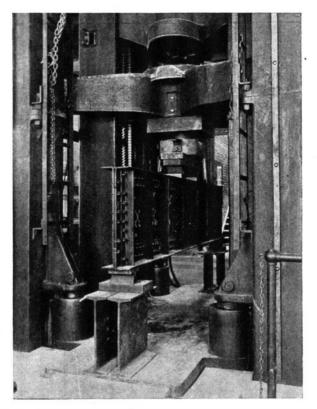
GIRDER IN TESTING MACHINE IN POSITION FOR TESTING
